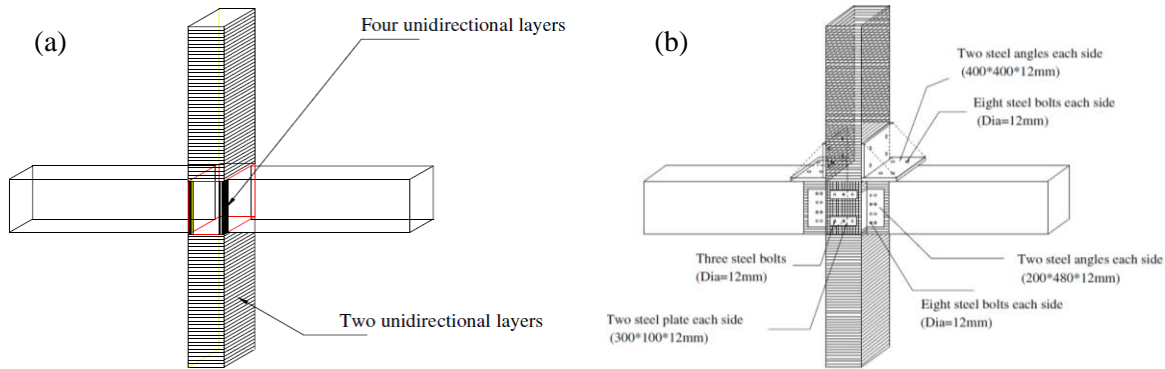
Column strengthening (Lee et al., 2010) – (a) without and (b) with steel angles.
